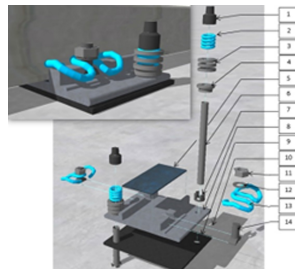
Illustration principle of classification of rail fastening systems due to the criterion of fixing rail with rail supporting structure: rail sleeper or track base plate (as an example – indirect fastening system). Key: 1 – protection cap, 2 – compression spring, 3 – correction bush, 4 – collar bush, 5 – rail pad, 6 – anchor bolt, 7 – centering cup, 8 – baseplate, 9 – baseplate pad, 10 – concrete track base plate, 11 – nut, 12 – washer, 13 – tension clamp type Skl 12, 14 – T-bolt [11]
